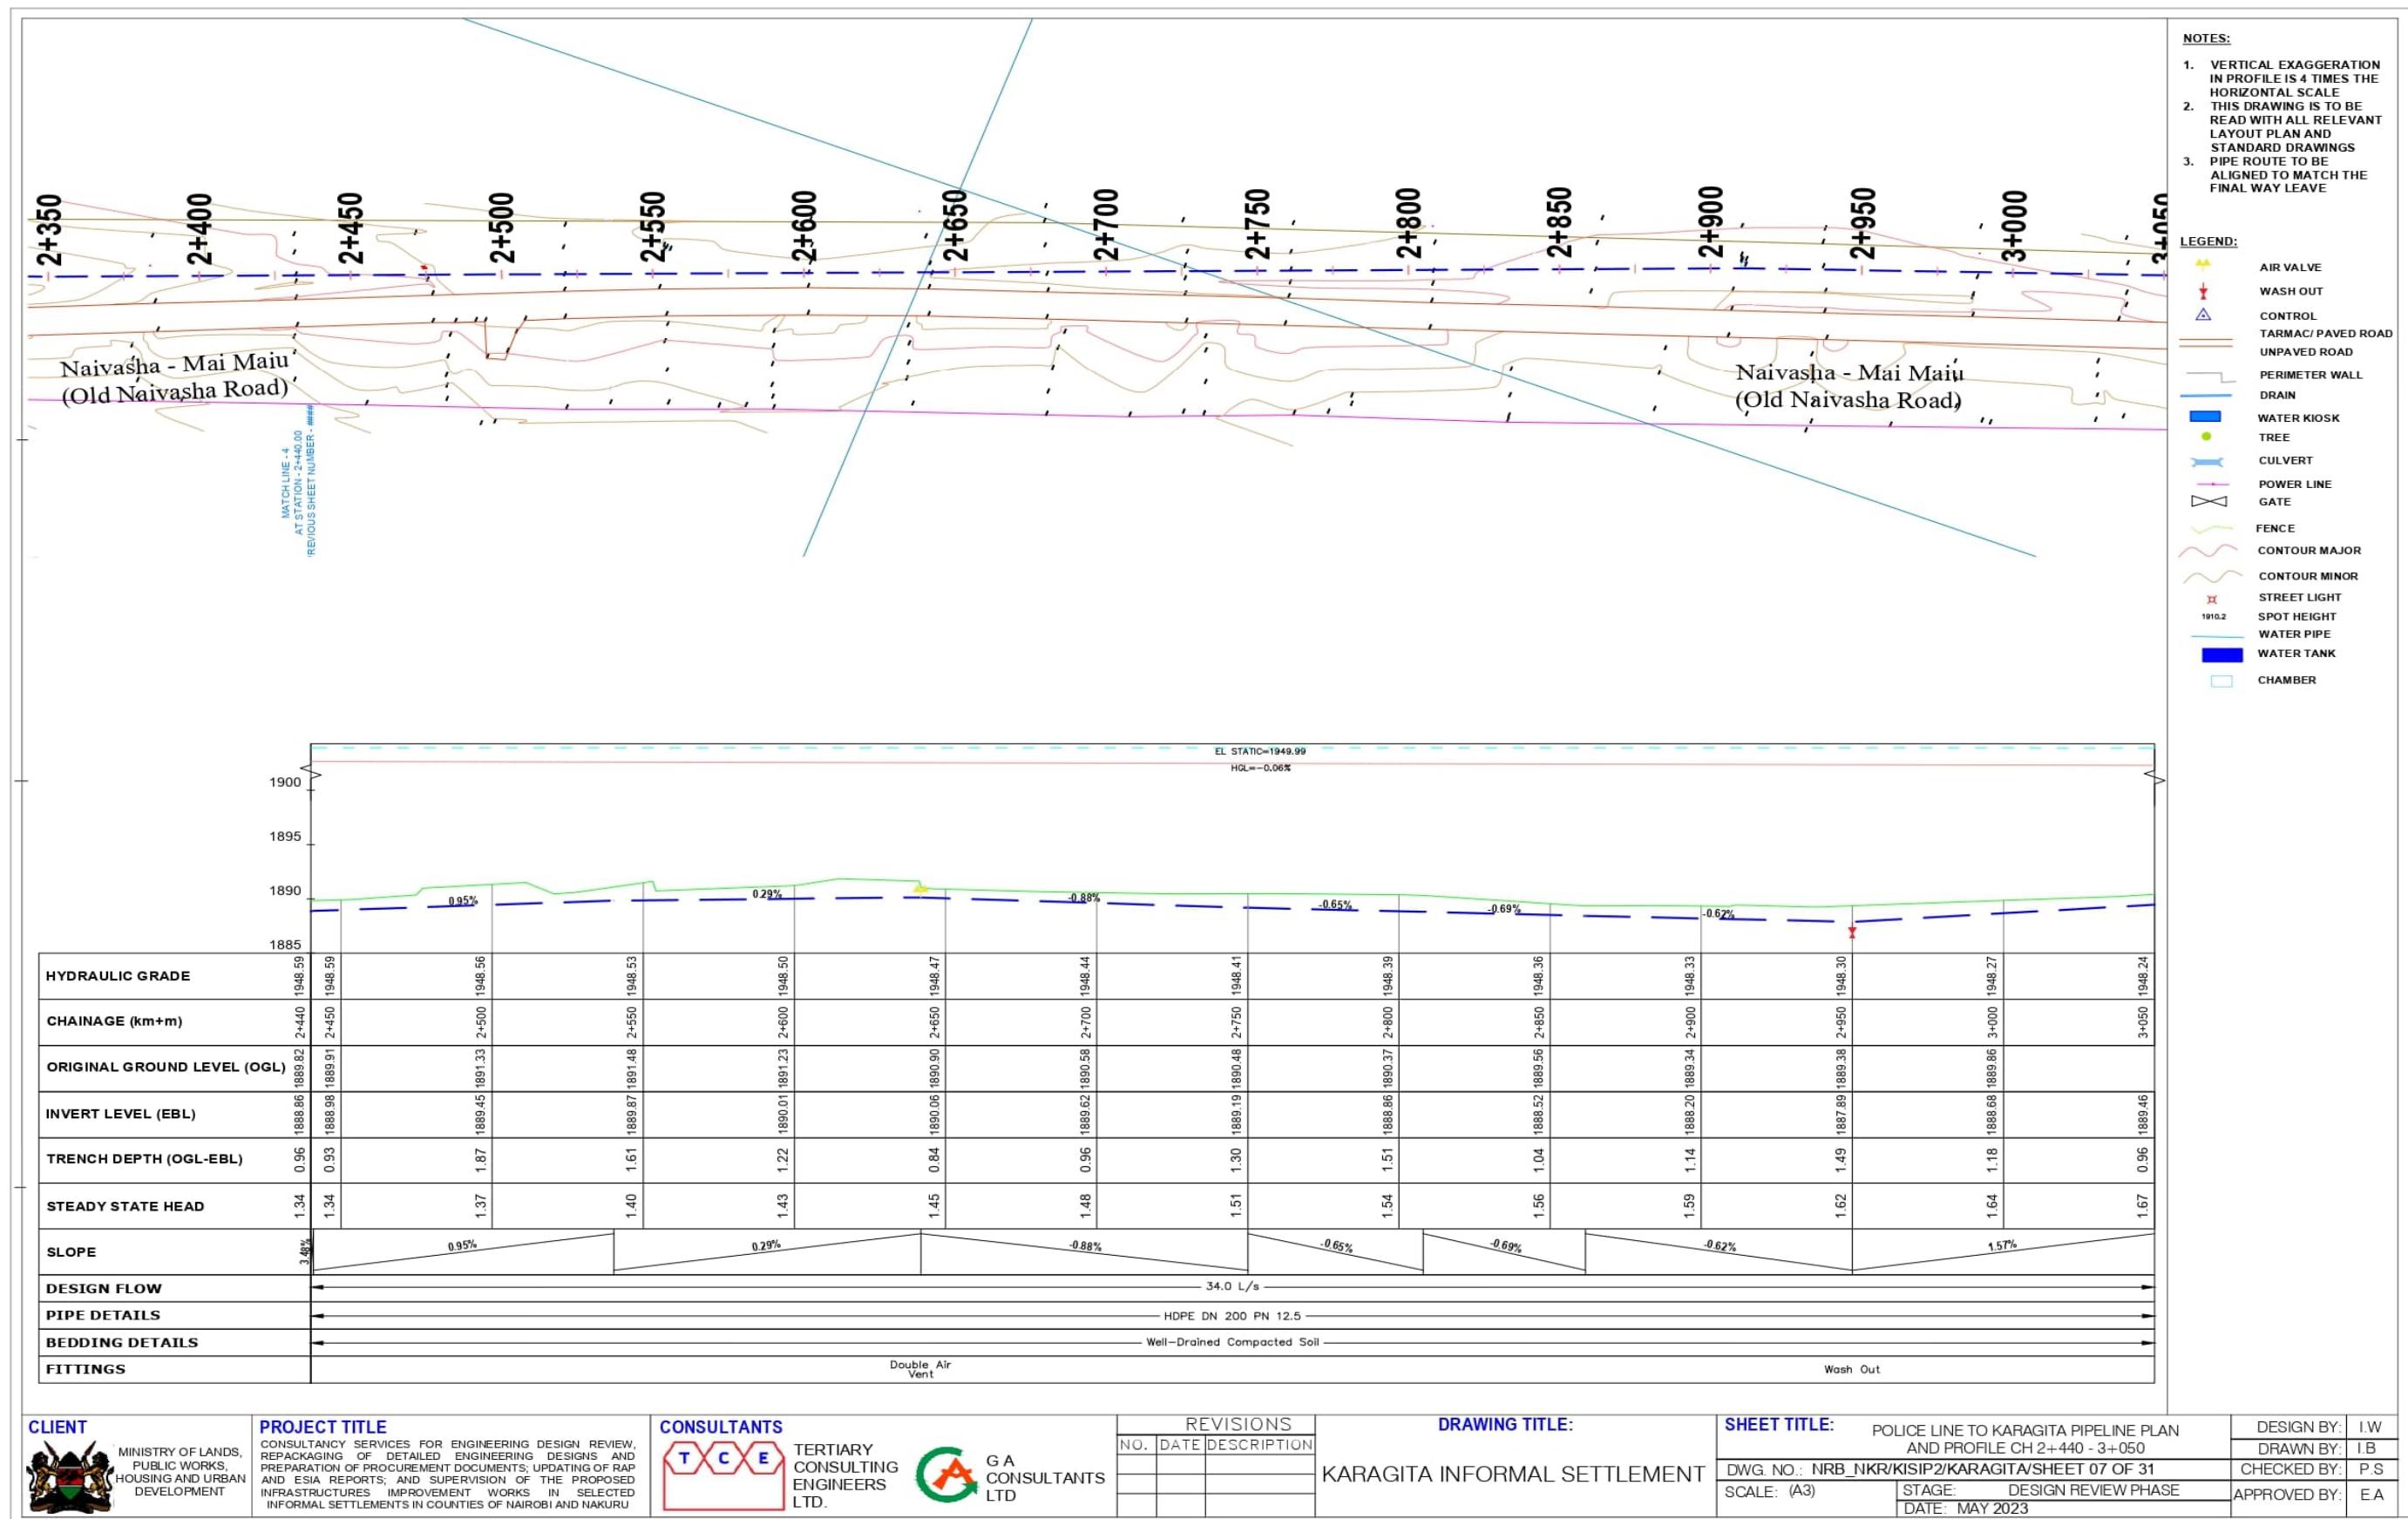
Karagita Design Engineering Layout Plan (5)
